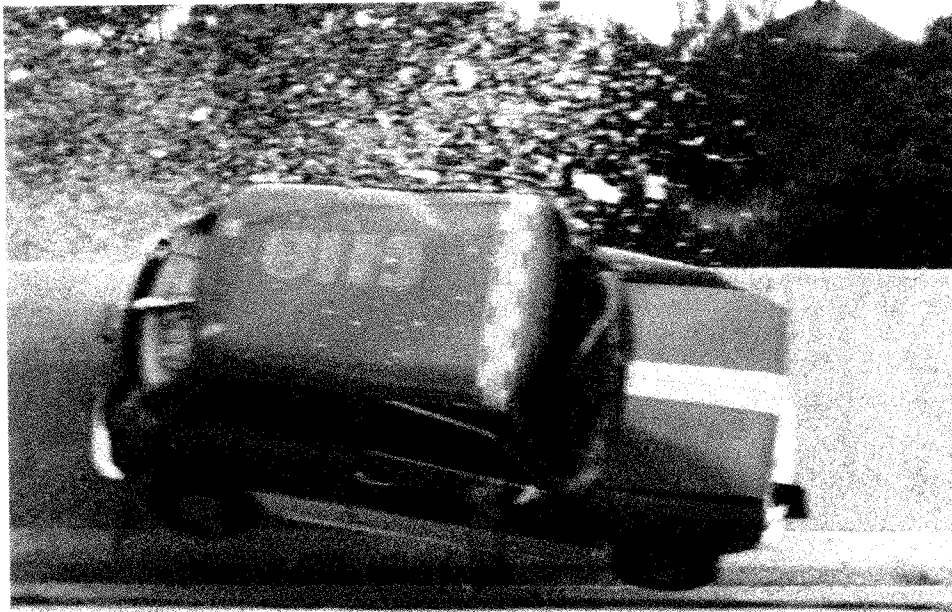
Test C118 — P6 concrete parapet — Shaped profile
